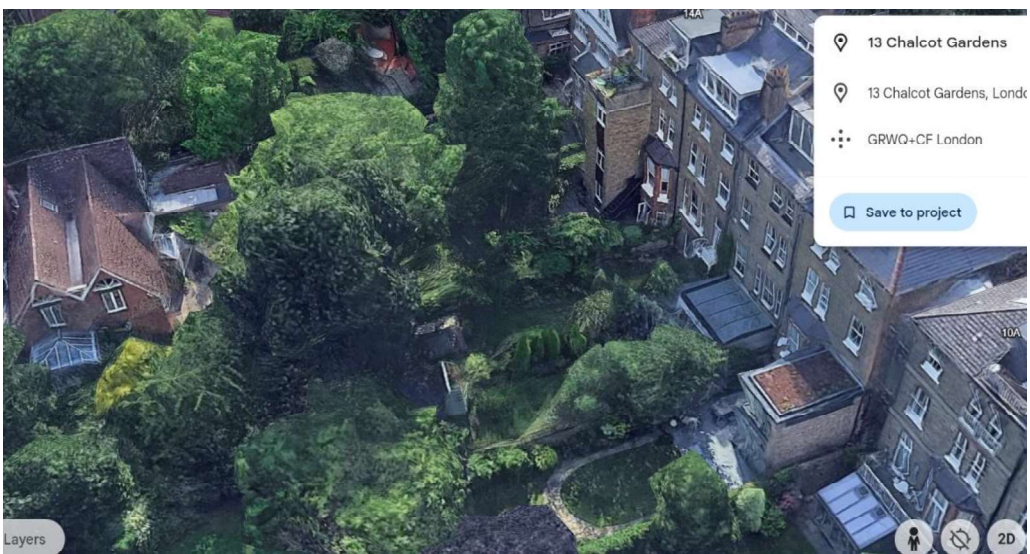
(Above) Aerial photo of site to show relationship of site to neighbours rear elevation and gardens.
